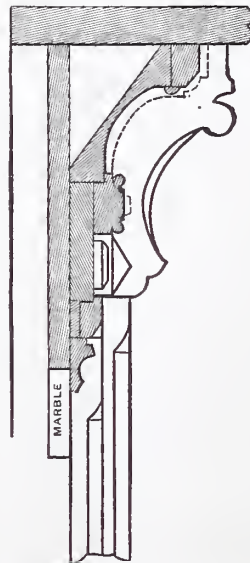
Detail of Bedroom Mantel—Scale, $1\frac{1}{2}$ inches to 1 foot.
